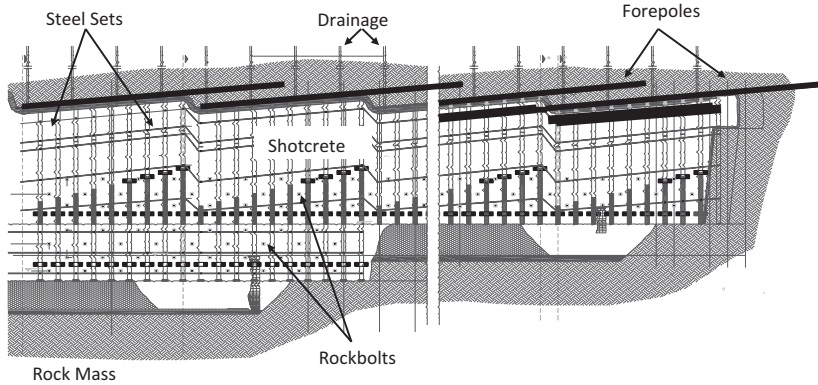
Longitudinal cross section of Driskos showing tunnel support detail (Structural Design SA 1999)
